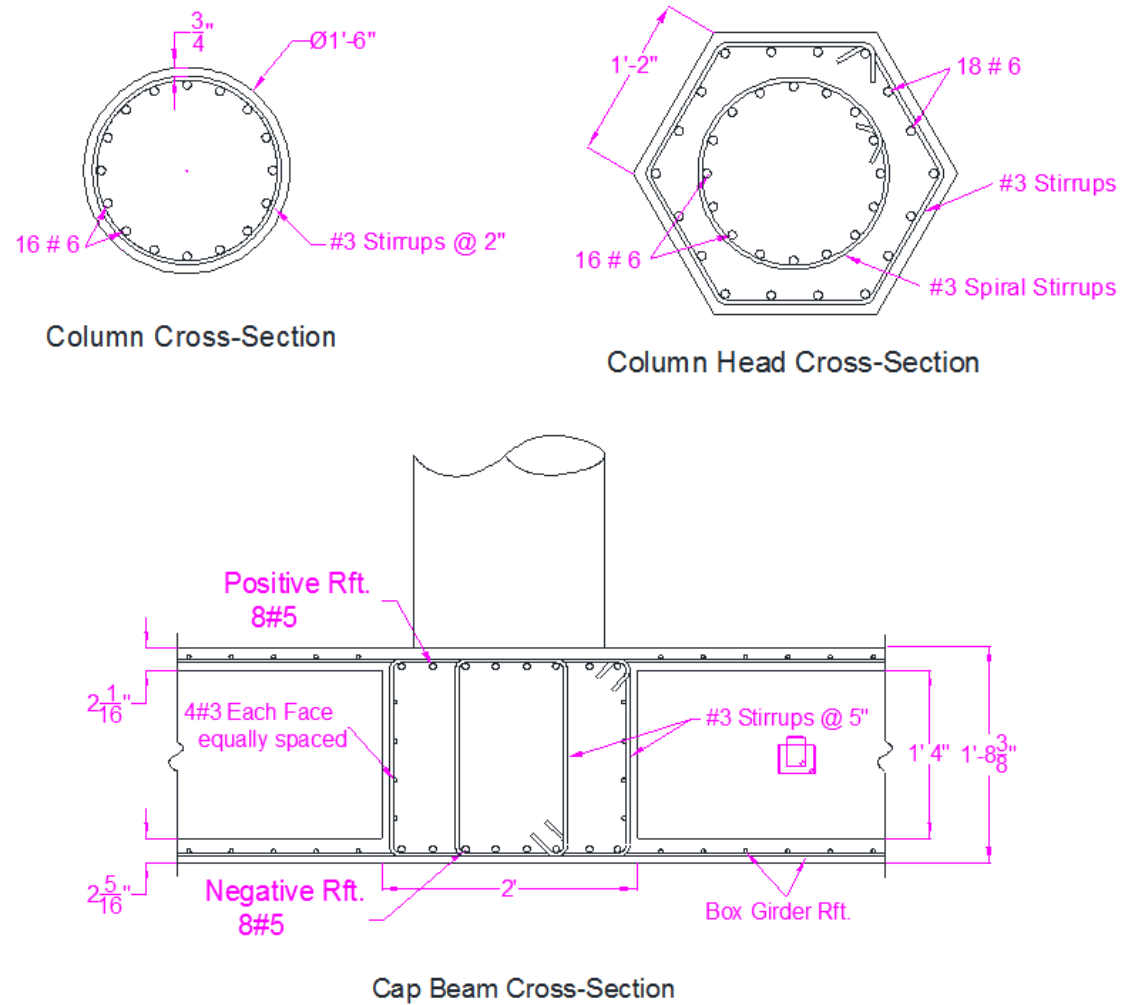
Details of the longitudinal and transverse reinforcement for the column and cap beam section of the specimens.
